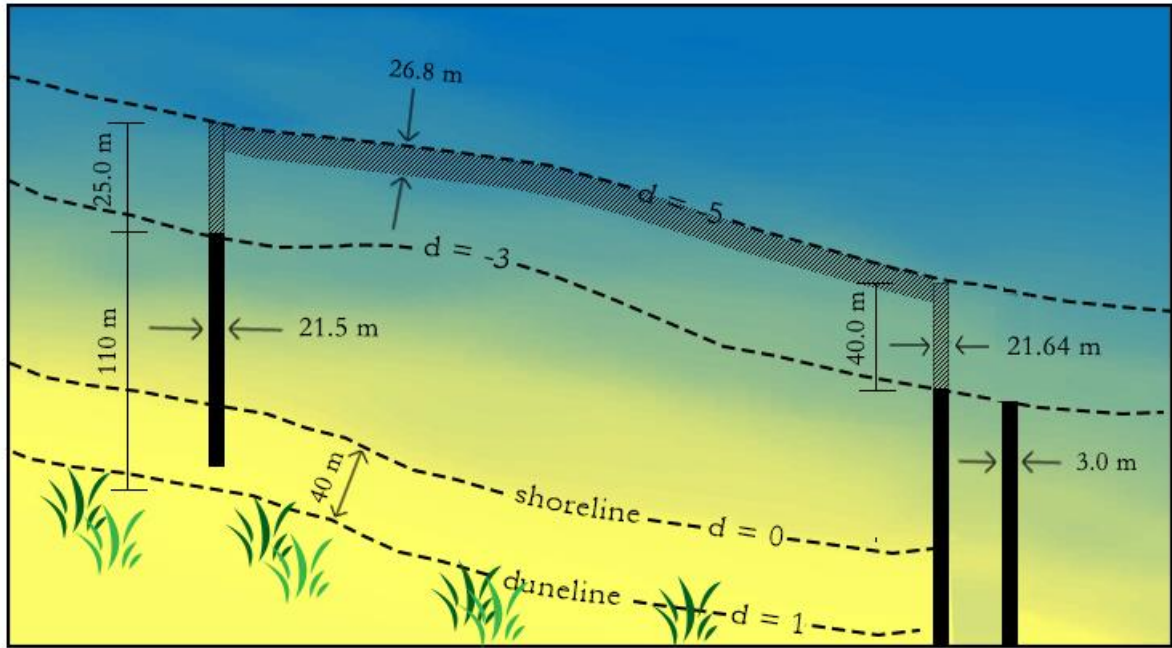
Submerged breakwater alternative plan view (not to scale)
